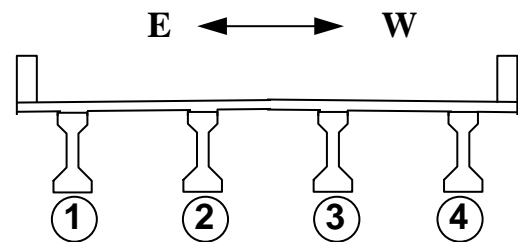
17 Transverse section of Waelder Bridge over I-10
